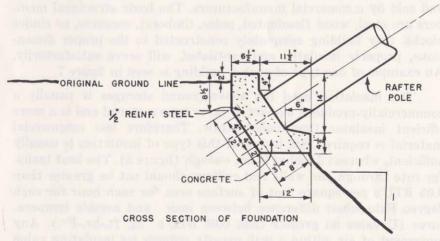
Cross-section detail of a concrete footing of sufficient size to be within the bearing capacity of a soft clay soil.
